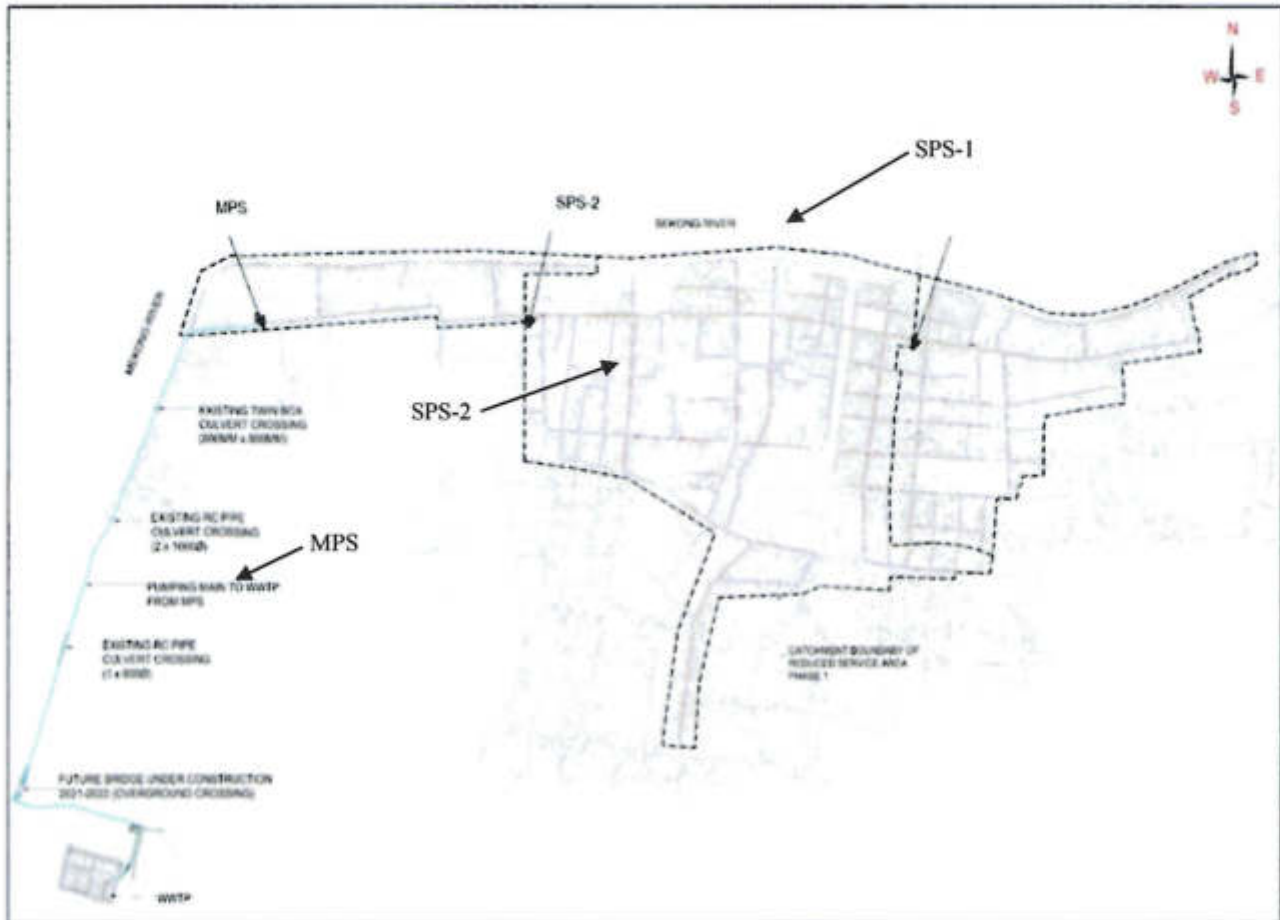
Overview of the Wastewater Treatment Plant Layout Plan
